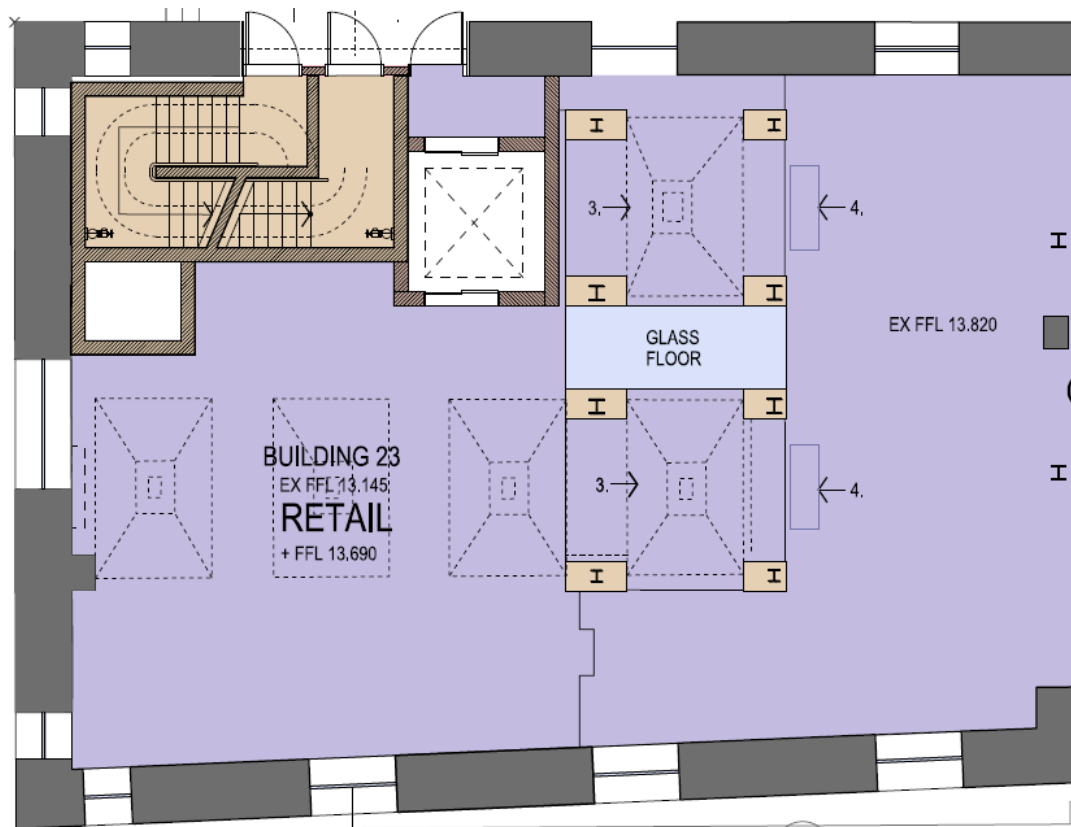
Part plan of proposed ground floor showing glass floor (enabling views to the associated basement plant) and indicating 5 of the reconstructed silo funnels
